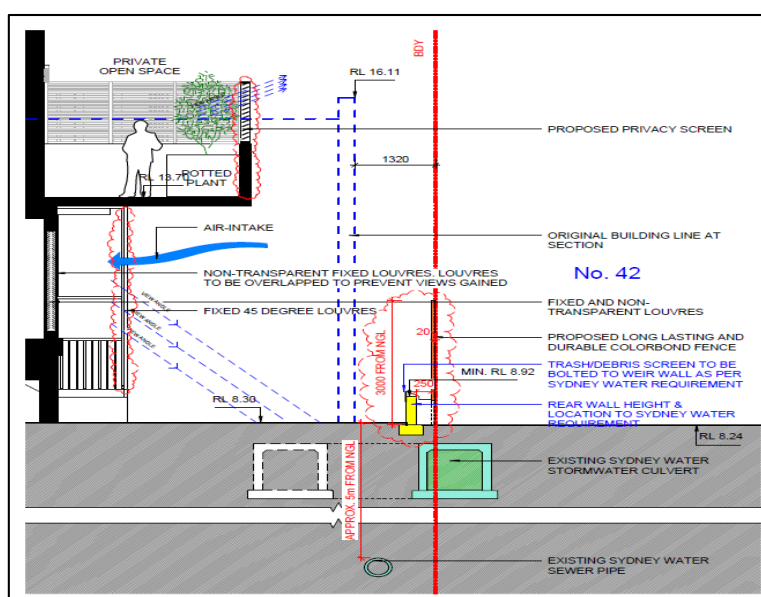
Type B fence along the southern boundary (section view adjoining 42 Miles Street)
